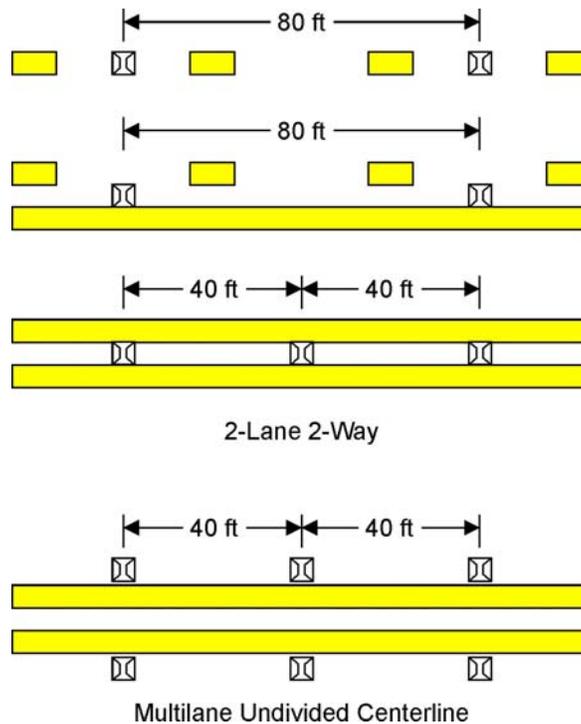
Recommended Layout of Raised Pavement Markers (RPM)
